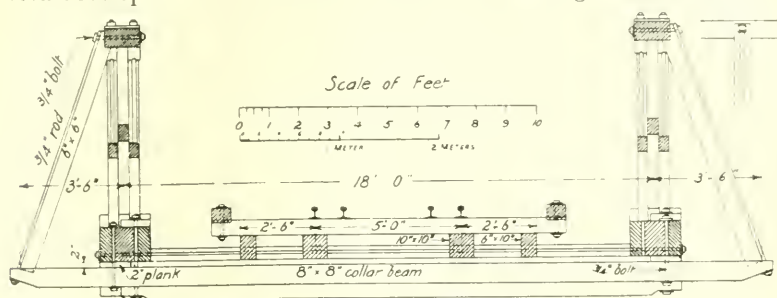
SWAY BRACING FOR PONY TRUSSES.
